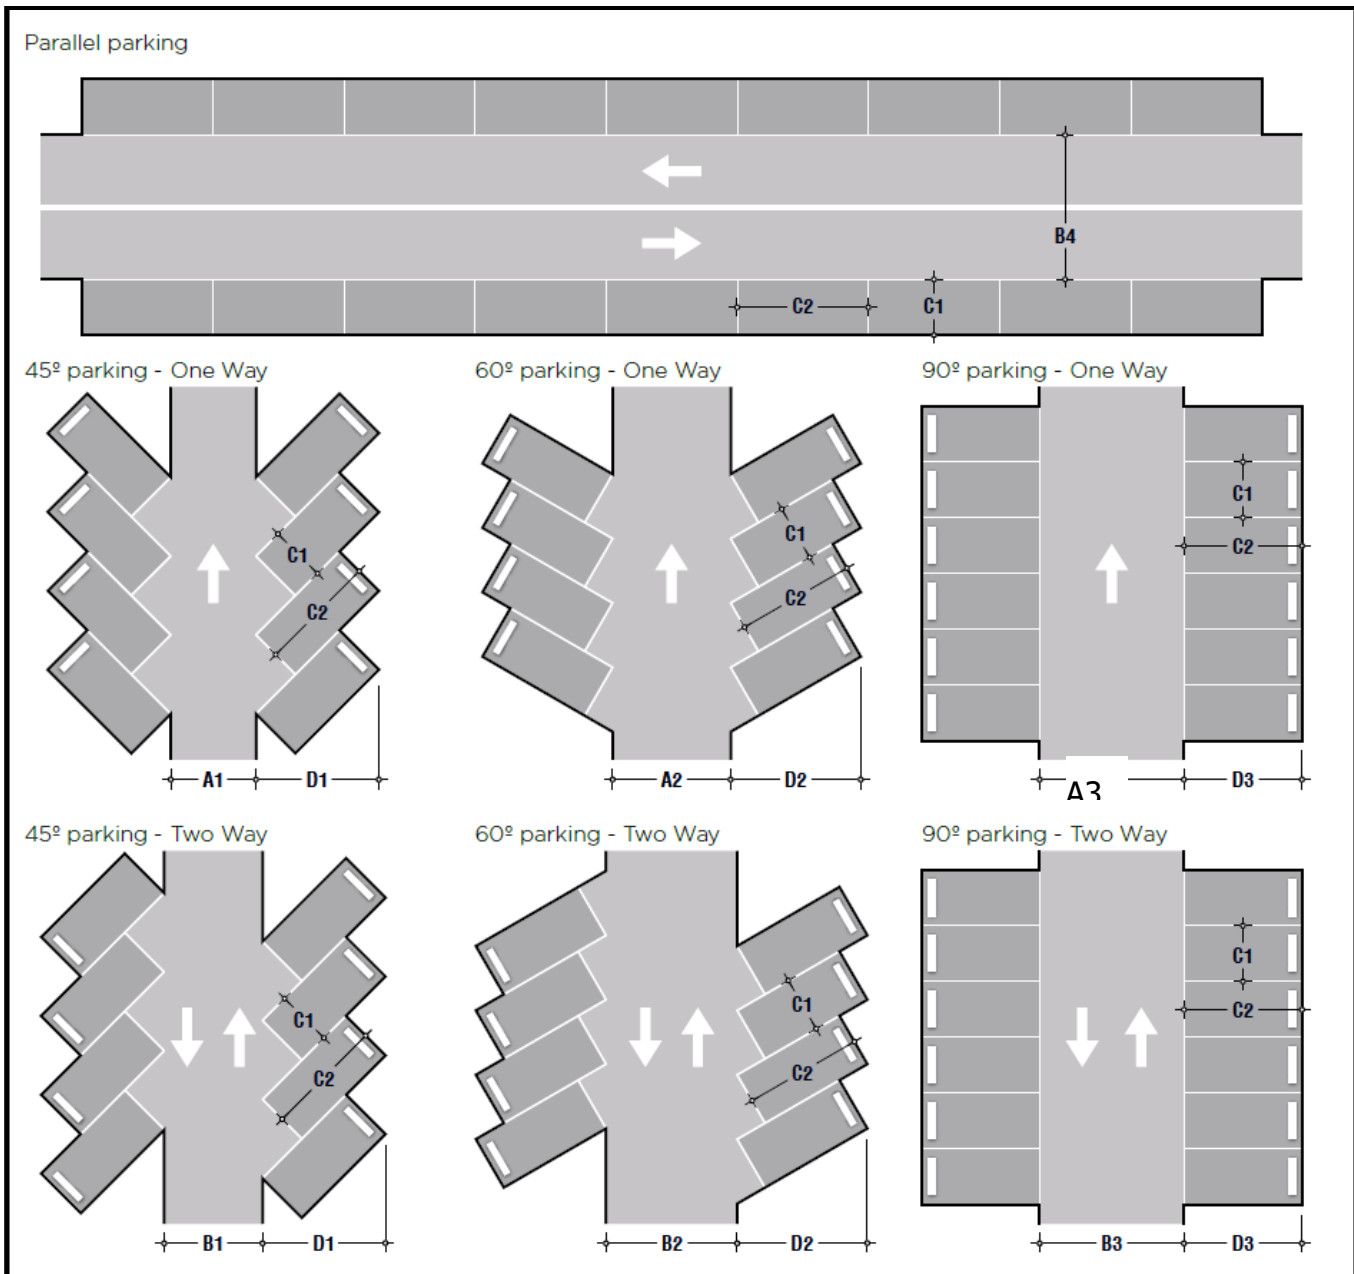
Parking Lot Stall, Aisle and Parking Bay Dimensions
